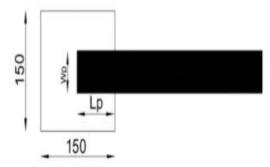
Specimen dimensions conform to the prescribed standards a) Tensile test specimen
